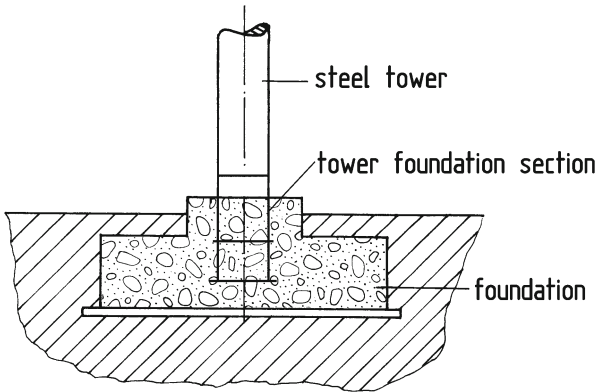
Standard foundation (slab foundation) for tubular-steel towers
